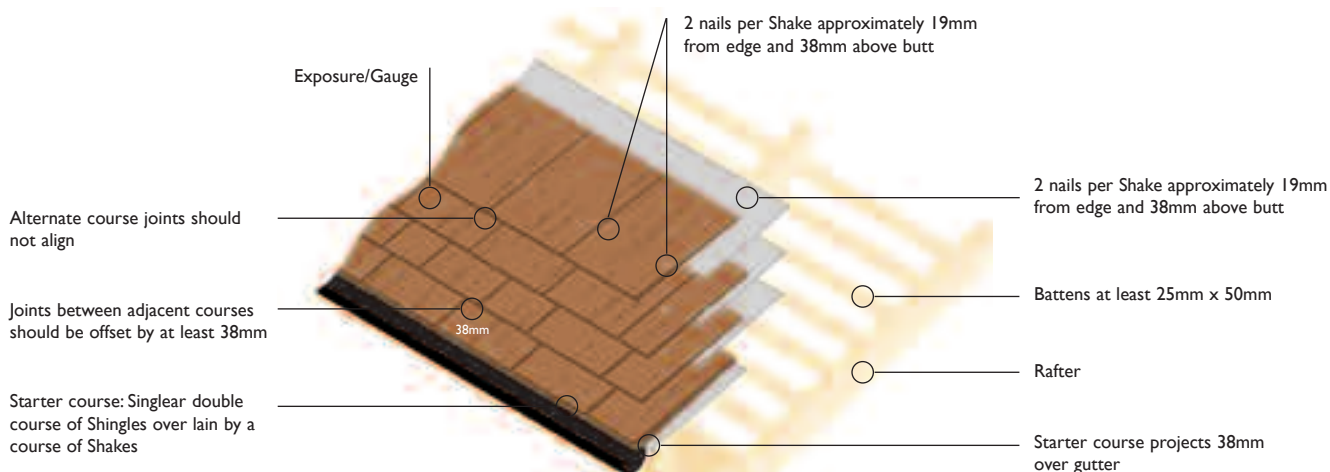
SPECIALITY SHINGLE FIXING DETAILS
